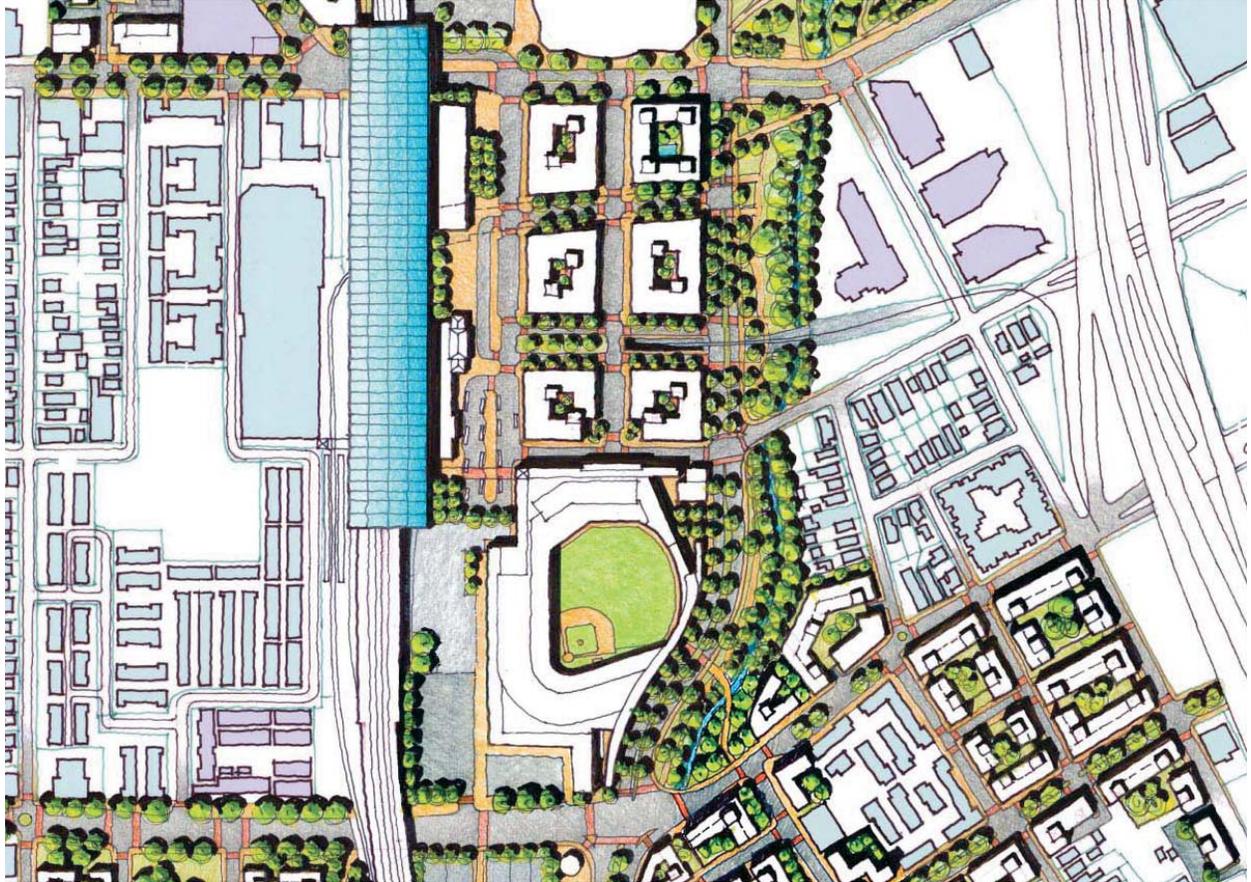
TEST-FIT PLAN - BUILDINGS AND USES - CENTRAL ZONE
